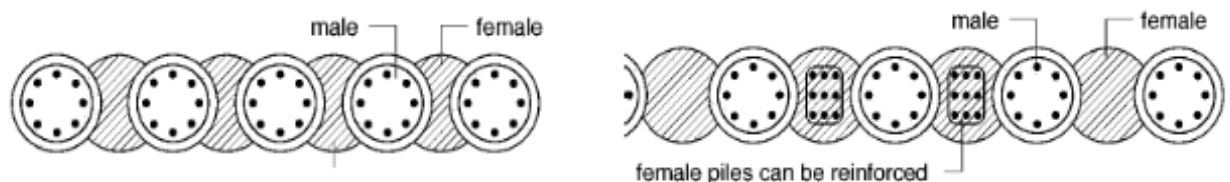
Typical secant pile wall arrangement with female (primary) and male (secondary) piles forming hard/soft walls (left) and hard/hard walls (right) after Suckling et al. (2005)
